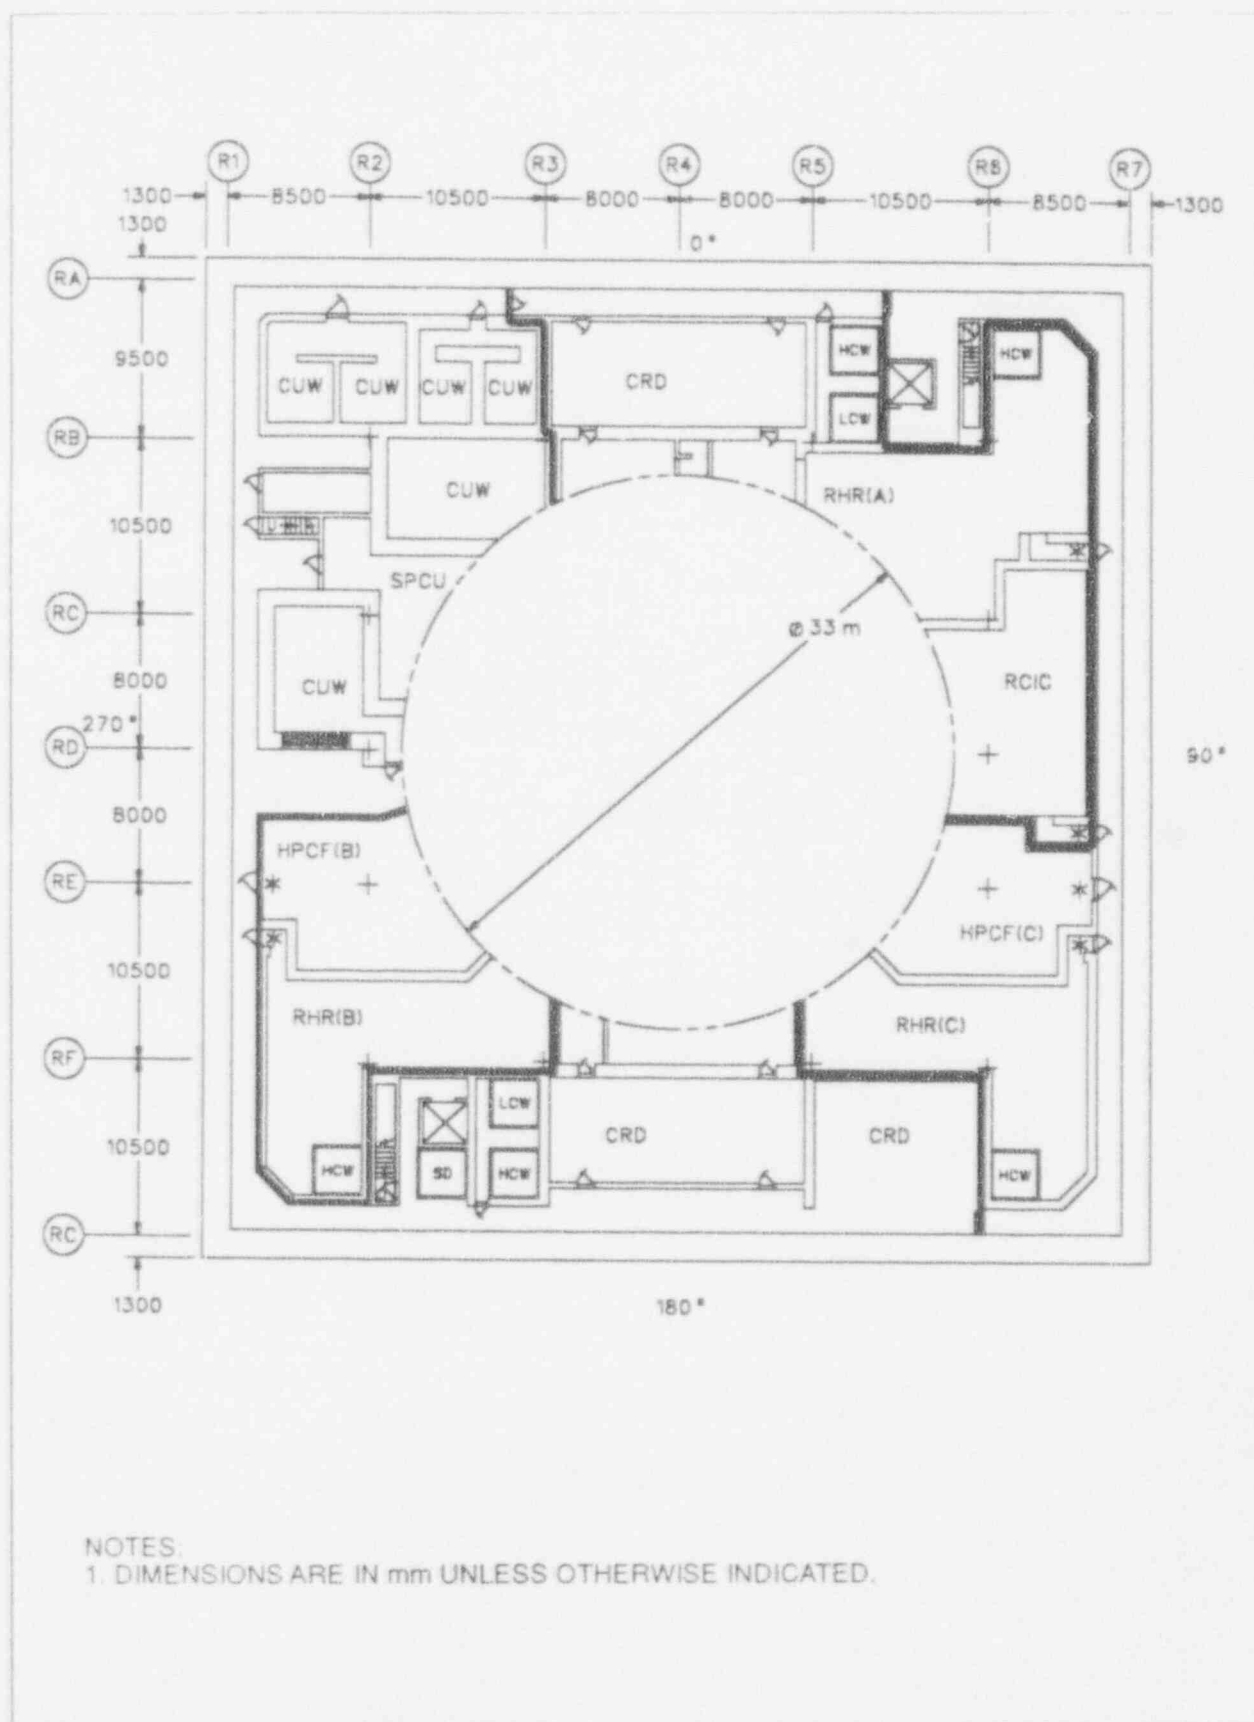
Reactor Building Arrangement Floor B3F with Divisional Boundary for Flood—Elevation -8200 mm
